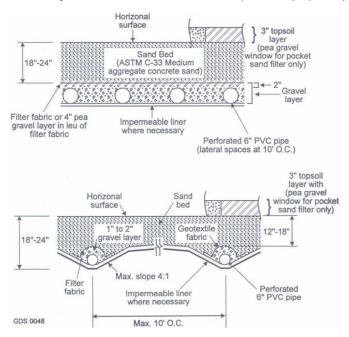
Typical Sand Filter Media Cross Sections
